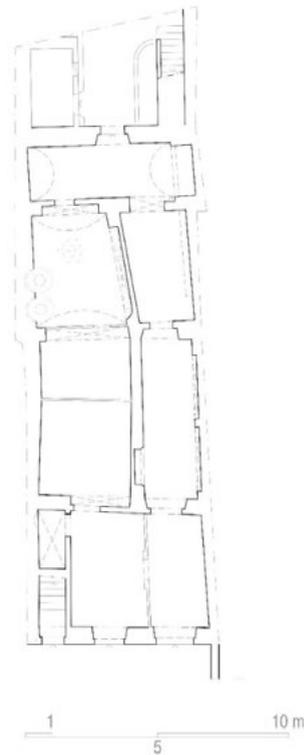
Groundfloor plan. Terreiro das Servas 13, Borba (Source: Rosado, 2021).
